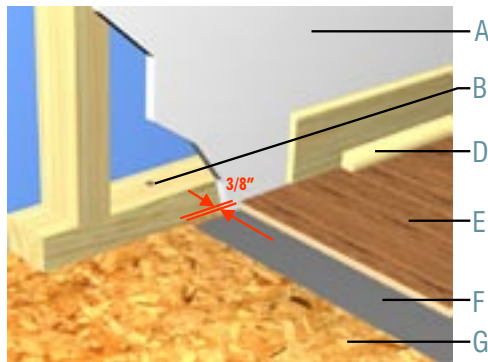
Perspective - Eng. Wood/Solid Wood Flooring
